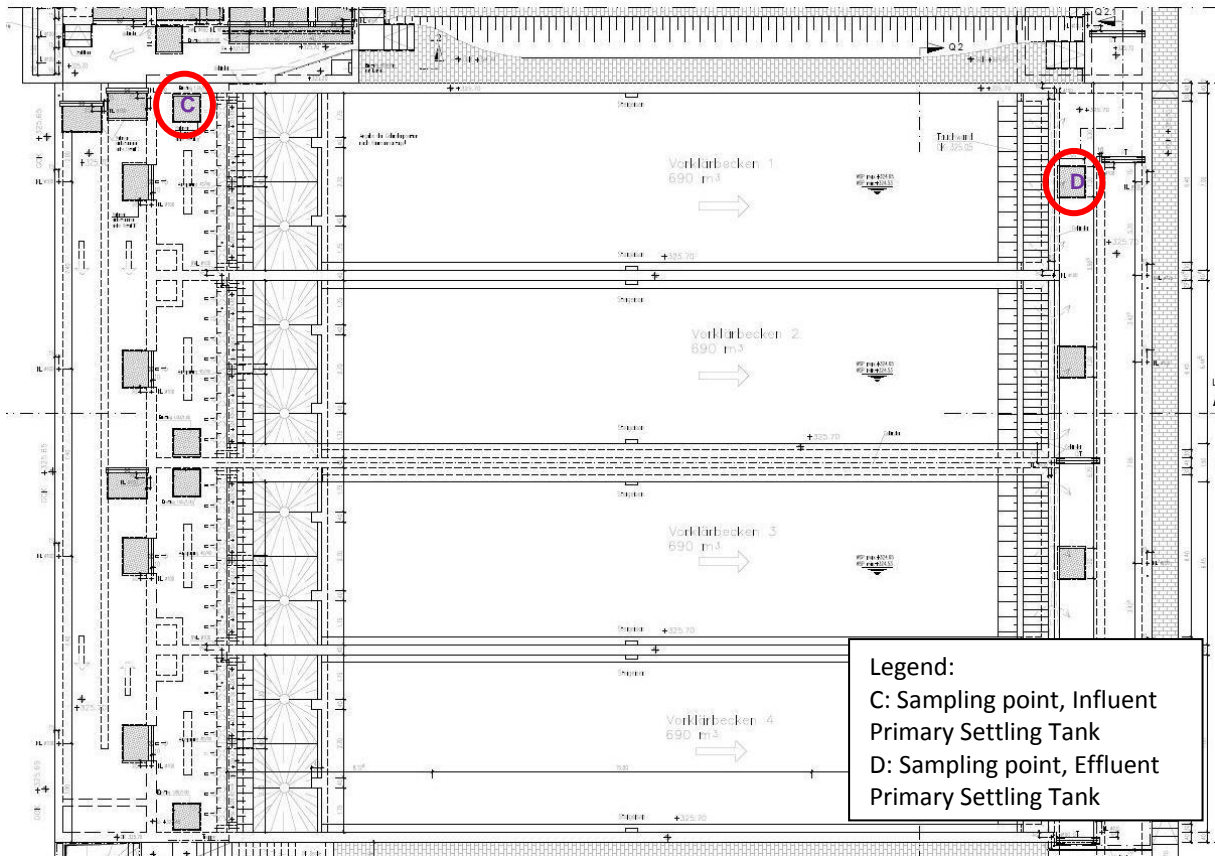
Layout plan of Sampling points at Primary Sedimentation Tank
